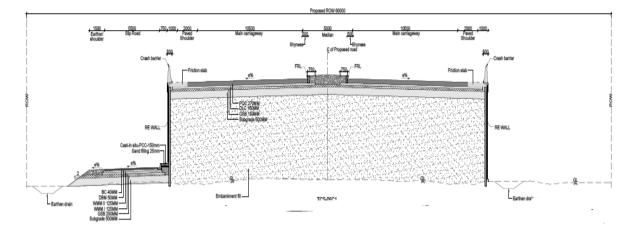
TCS-6C1 Typical Four Lane Underpass Cross Section with Slip Roads in Bypass & Realignment
